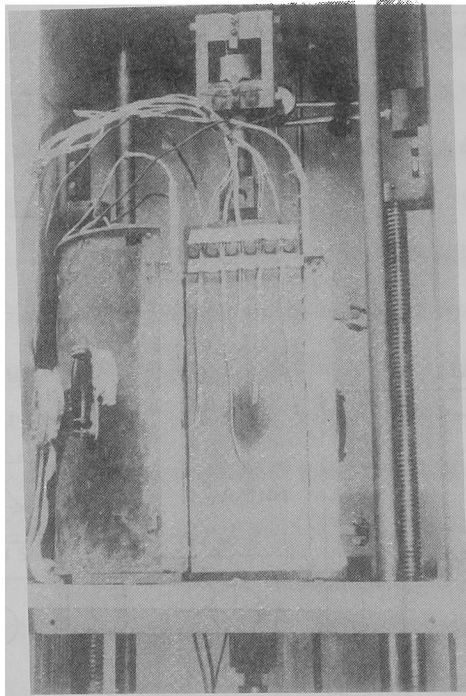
Photograph of CN(L) specimen settled in creep testing machine.
